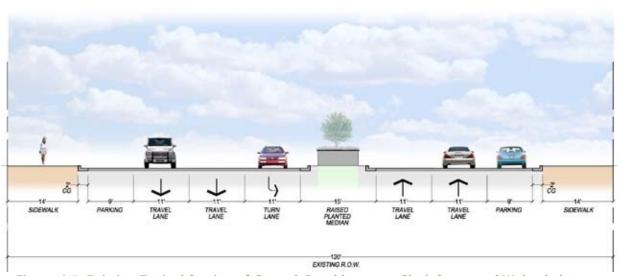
Existing Typical Section of Cermak Road between Clark Street and Wabash Avenue
